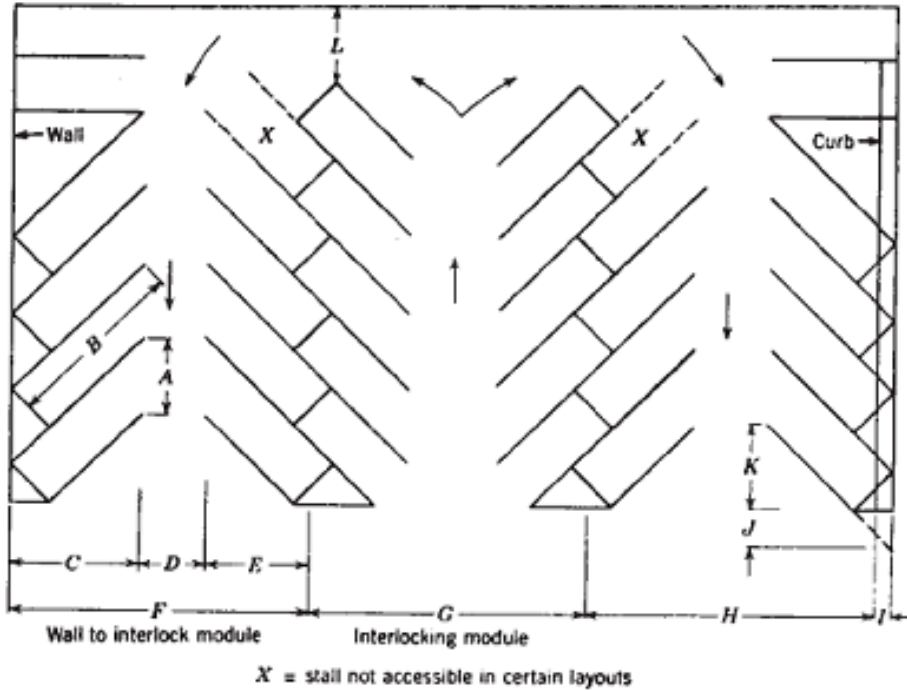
Typical parking layout (Asphalt Pavement Association of Indiana).
